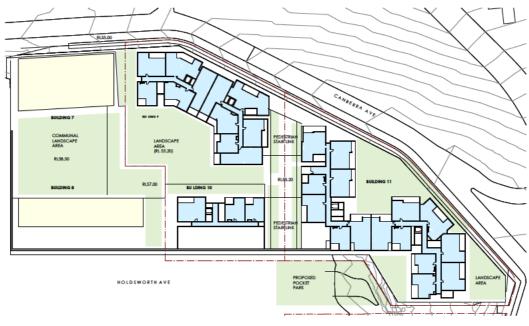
Proposed building envelopes Source: Kann Finch Architects
